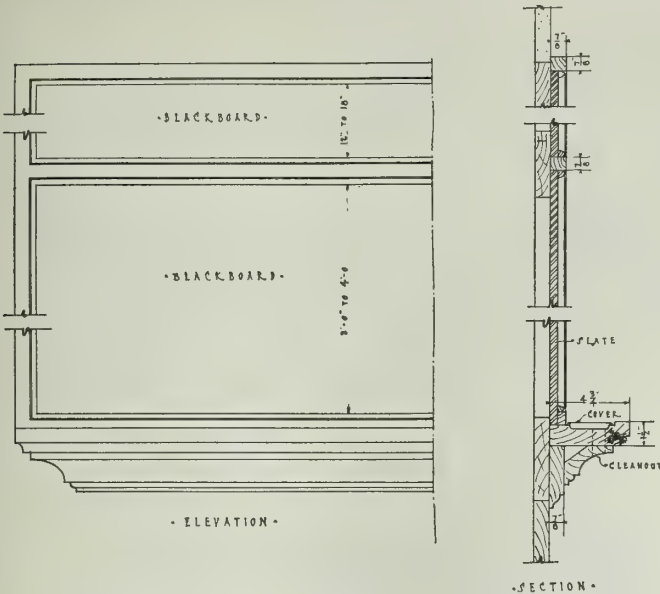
DETAIL SHOWING DOUBLE TIER BLACKBOARD ARRANGEMENT
